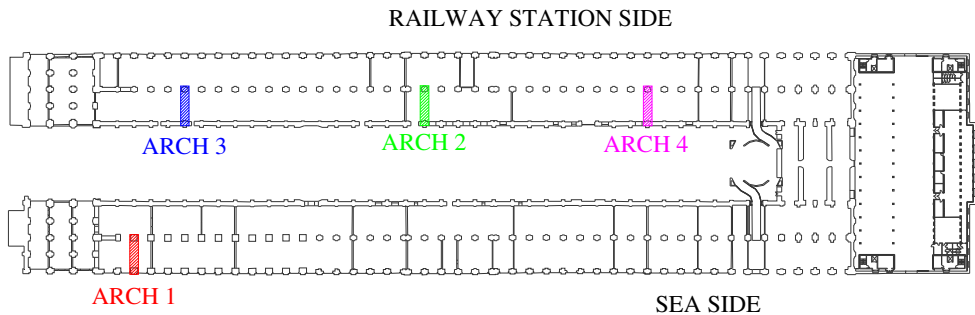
Plant of the ground floor of the storehouses with indication of the arches subject to testing.
